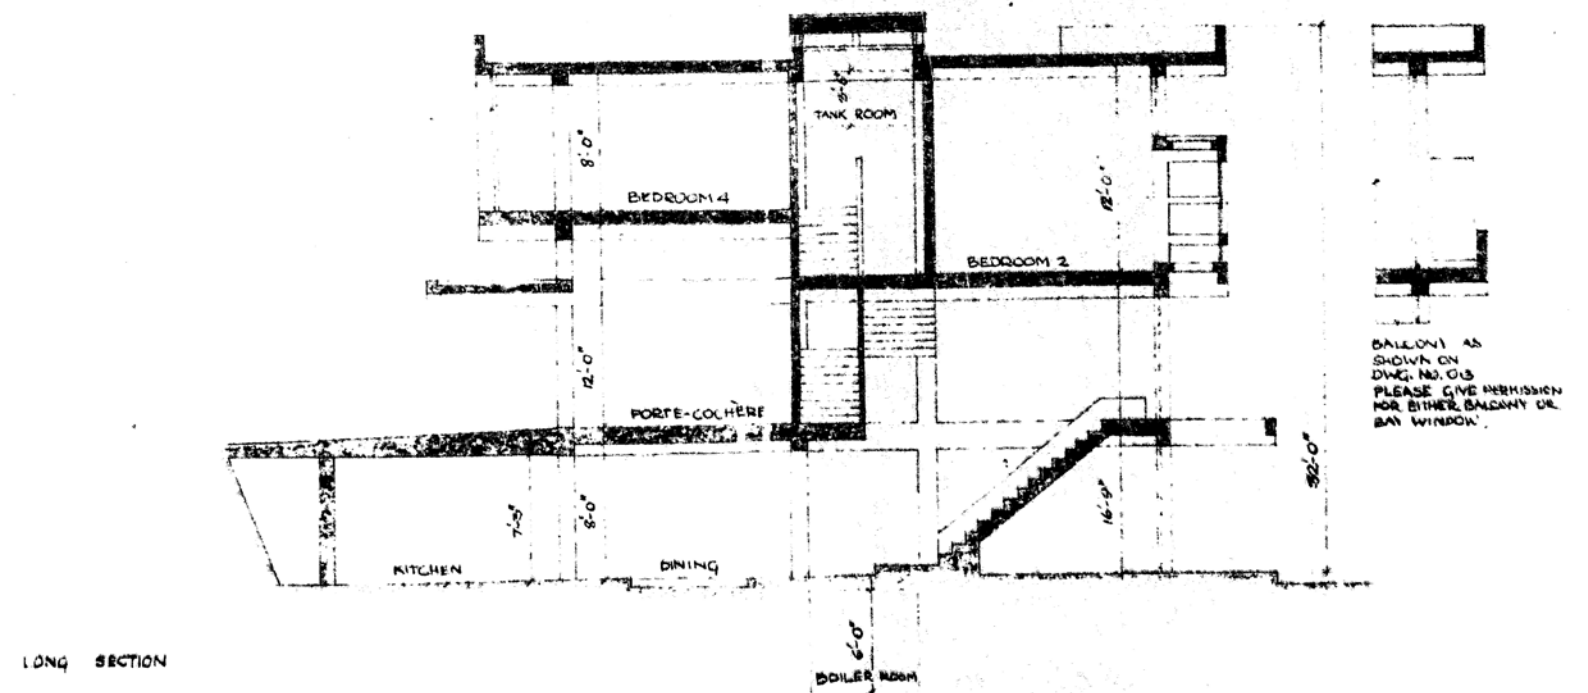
1962 long section from drainage plans (Camden Local Studies and Archive).
